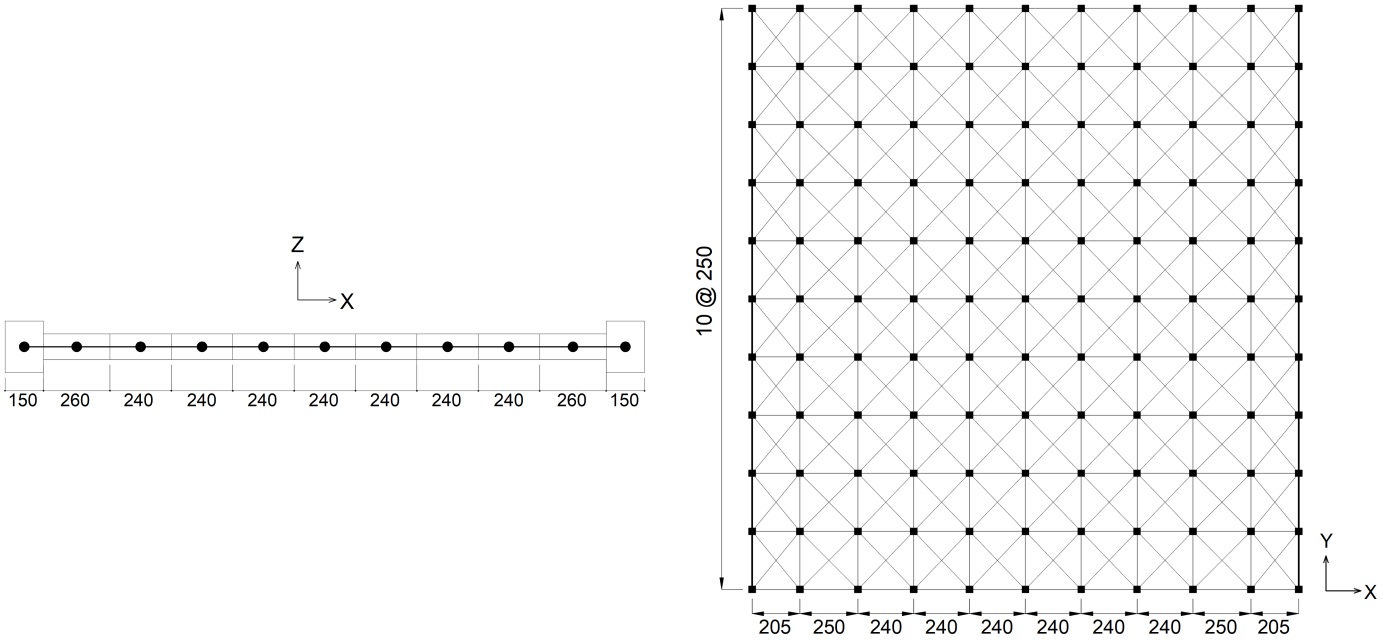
Plan and elevation views of the beam-truss model for Unit 1.0 [Unit: *mm*].
